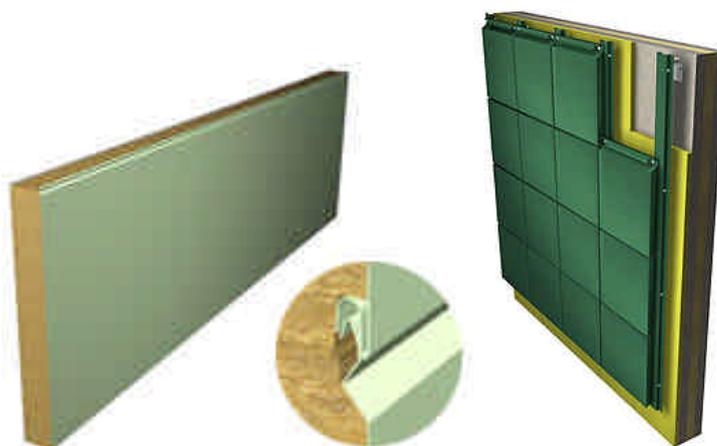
Composite panel for e.g. industrial applications. To the left a Plannja panel (www.plannja.se). To the right a Liberta Grande facade cassettes. Cassettes made of sheet metal bent at all four sides with a stiffened backside, which enables creating larger and more plane-like surfaces. The details of the cassette system are based on the Liberta cassettes.
